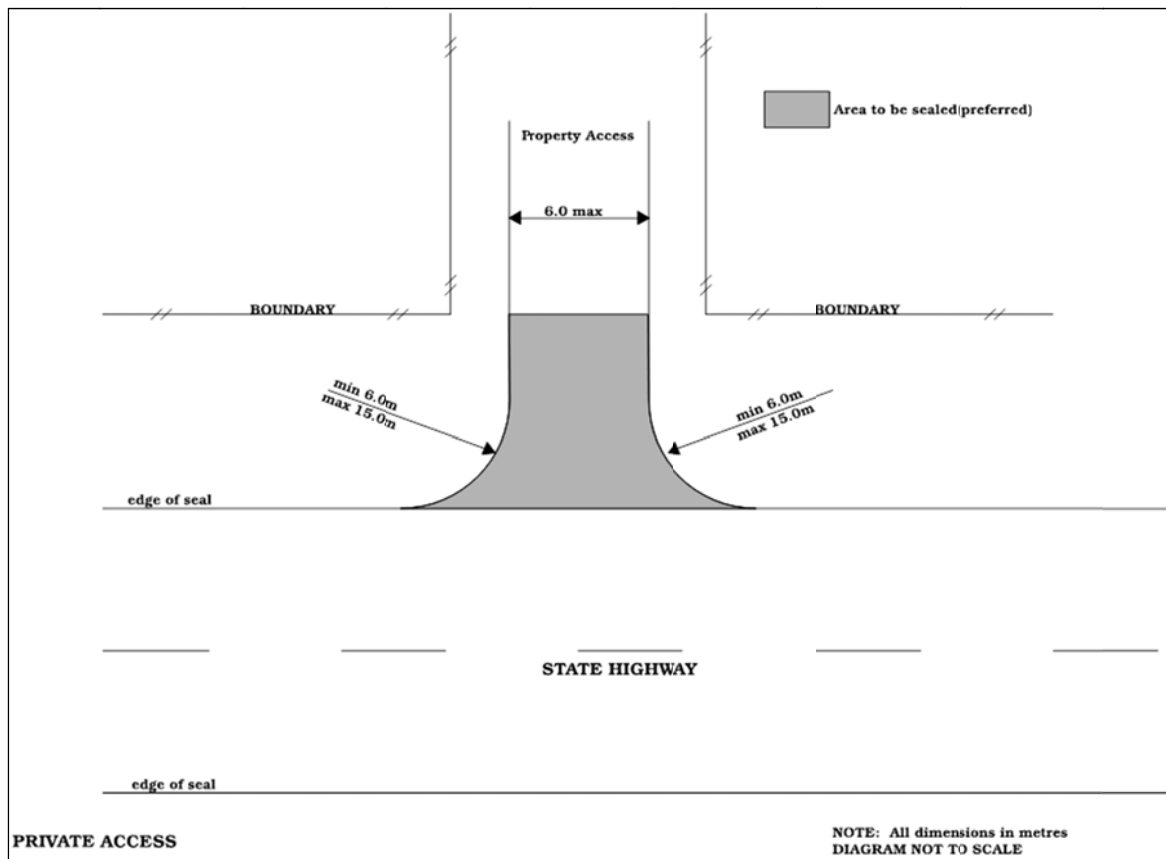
PRIVATE ACCESS ONTO STATE HIGHWAYS
